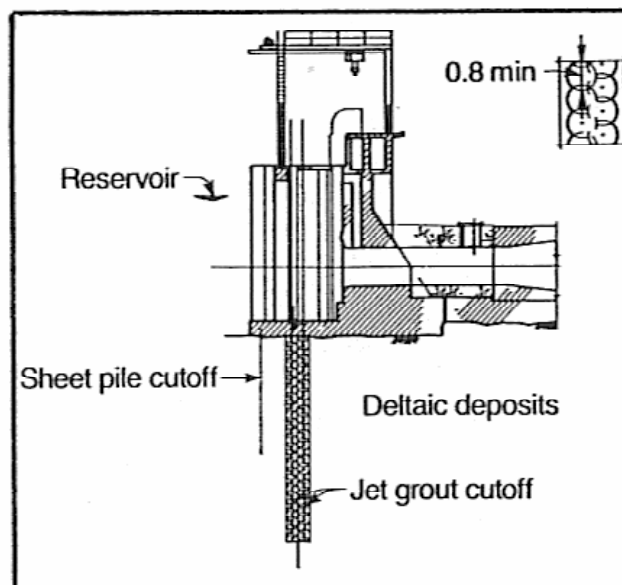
Jet grouting under concrete structure, John Hart Dam (62).
